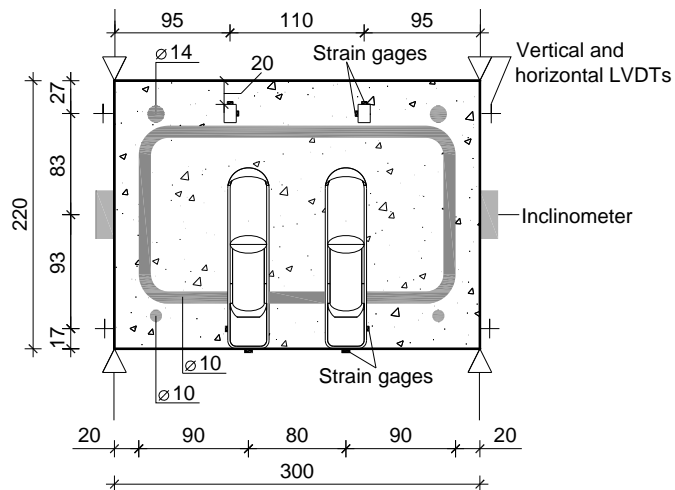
Cross section of experimental beam with one thermal break unit, concrete reinforcement and instrumentation, dimensions in (mm).
